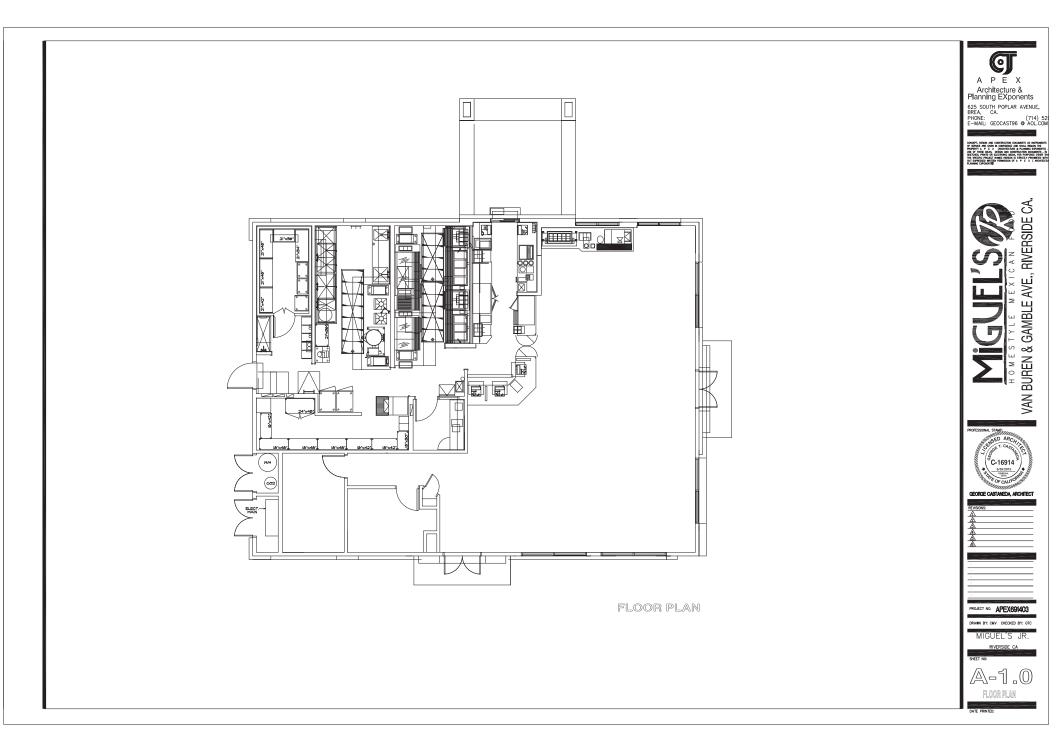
P15-0303, -0304, -0305, P14-0973, Floor Plan Building 2
